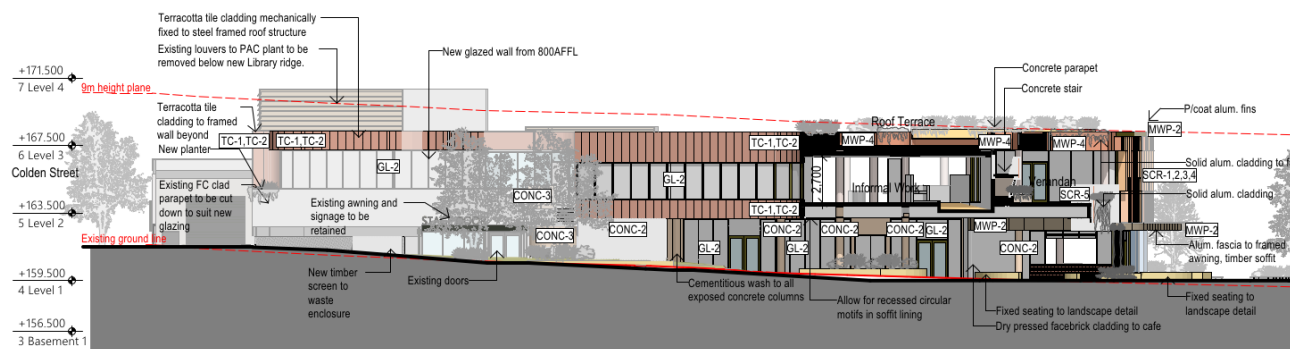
| East West Link elevation of Library showing 9m height plane
